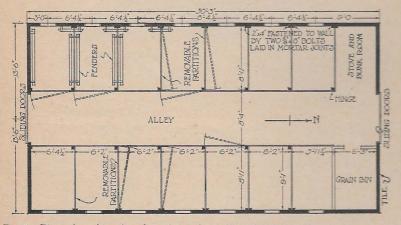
Floor plan of north and south hog house No. 10.72-51, showing pen arrangement.
